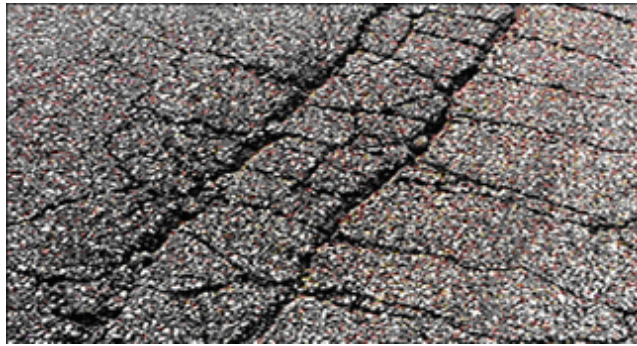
Fatigue cracking (courtesy ARRA)
